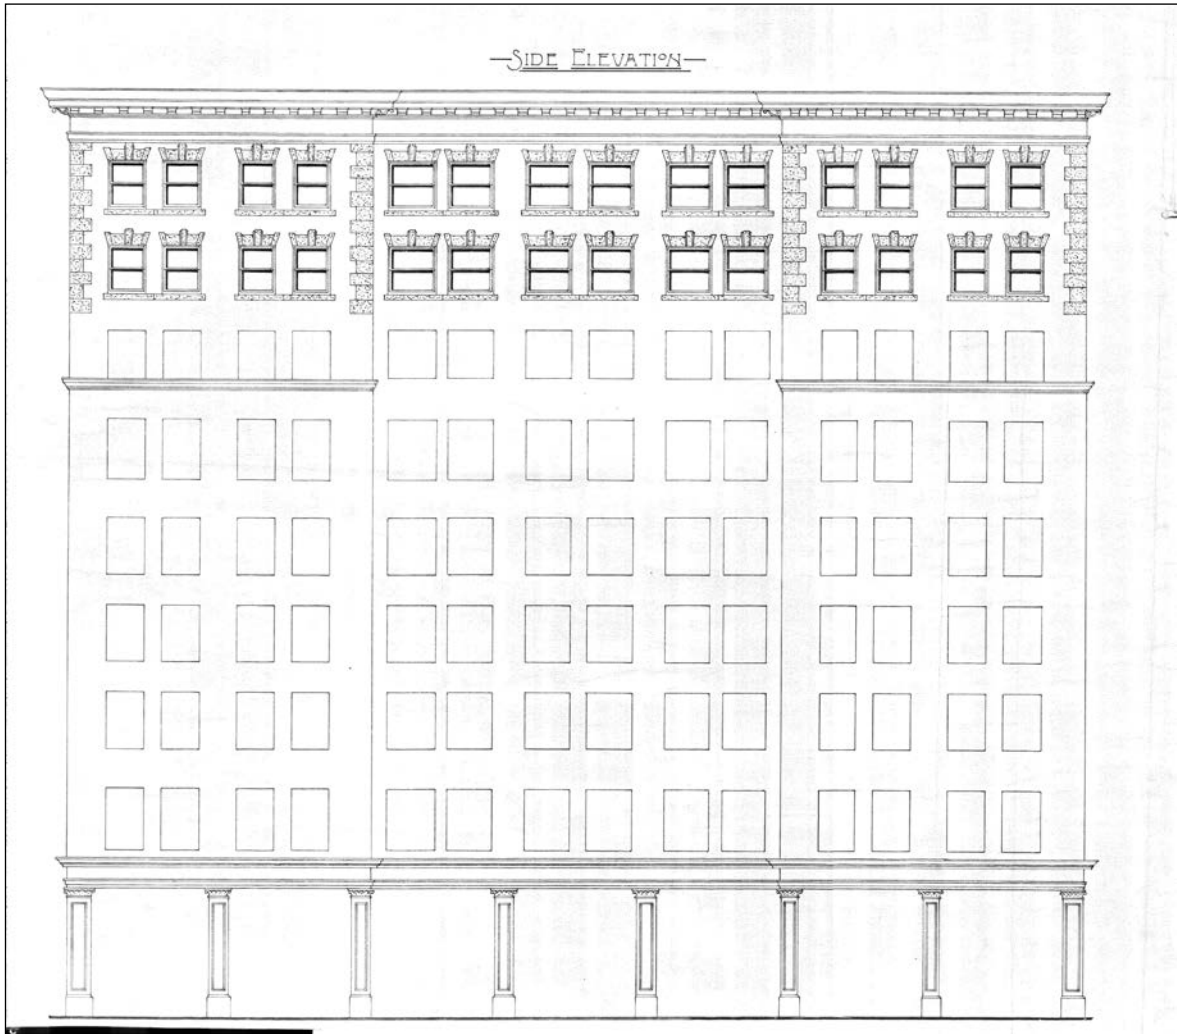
Somerset Building, Portage Avenue, Architect's Plans, "Side Elevation," 1911.
